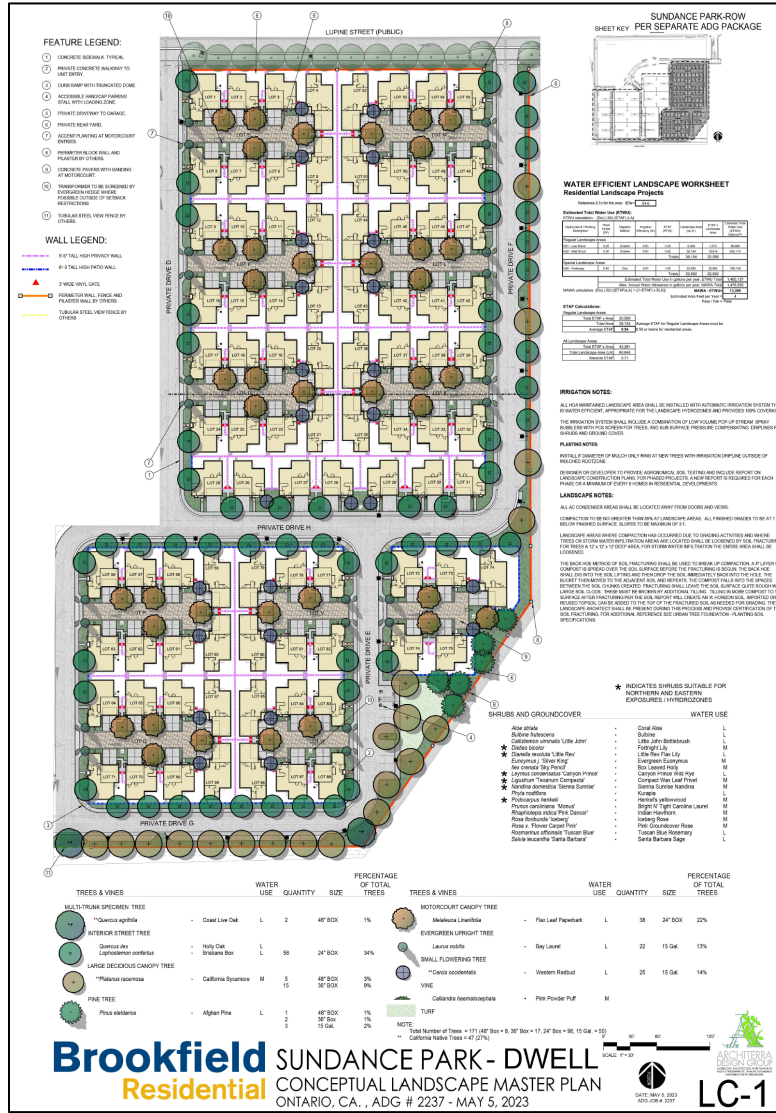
Exhibit E: LANDSCAPE PLAN (COURTYARD TOWNHOMES)
